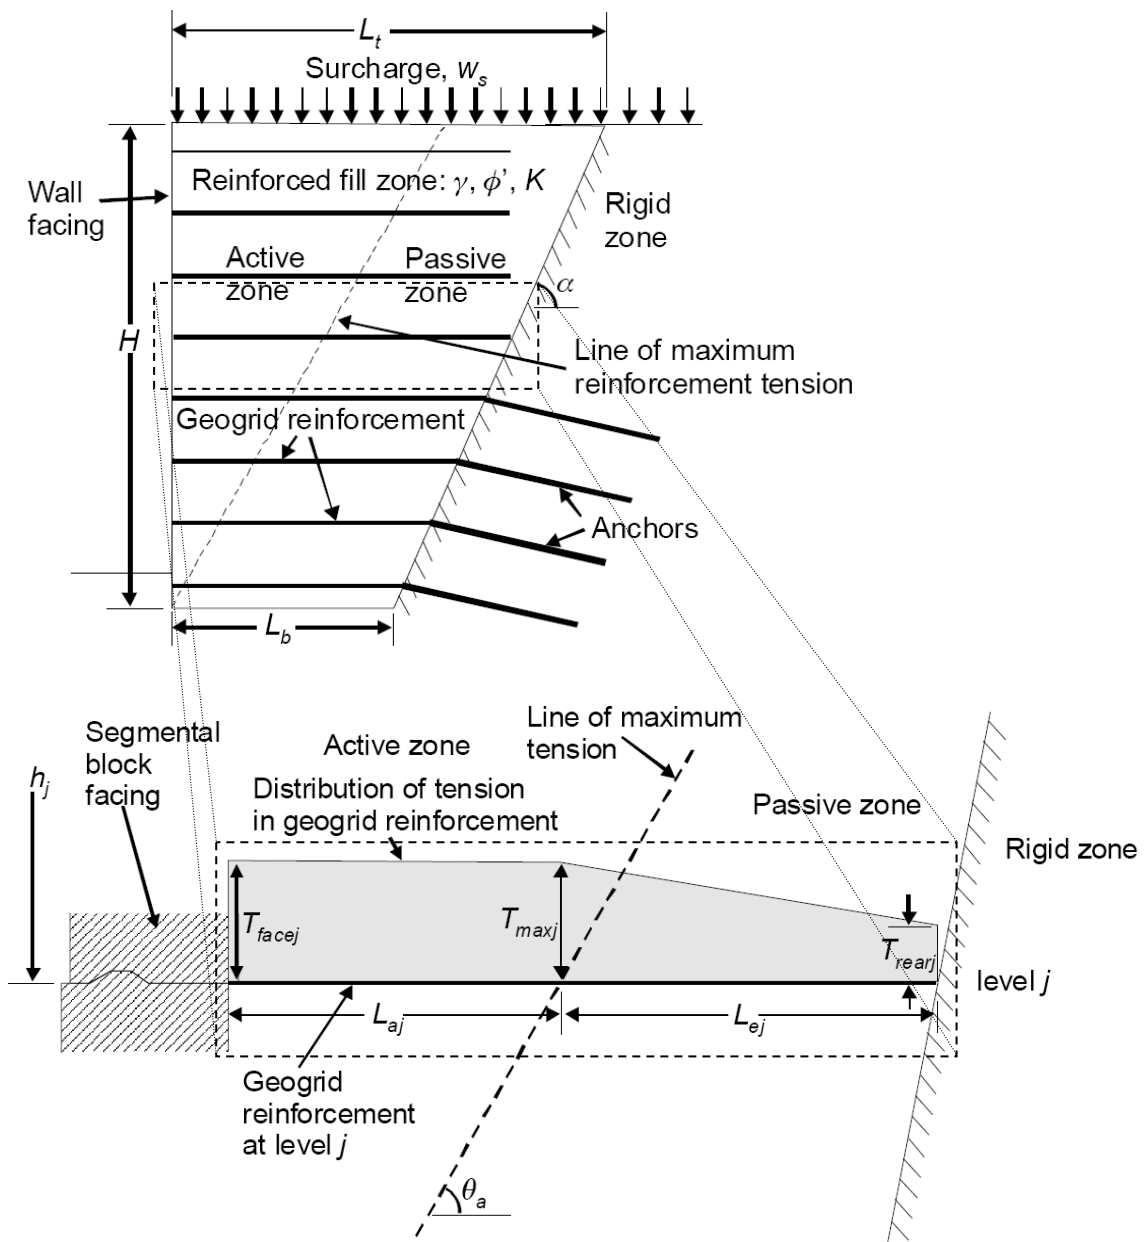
Reinforced soil retaining walls where the extent of the reinforced fill zone is constrained according to Lawson & Yee (2008).
